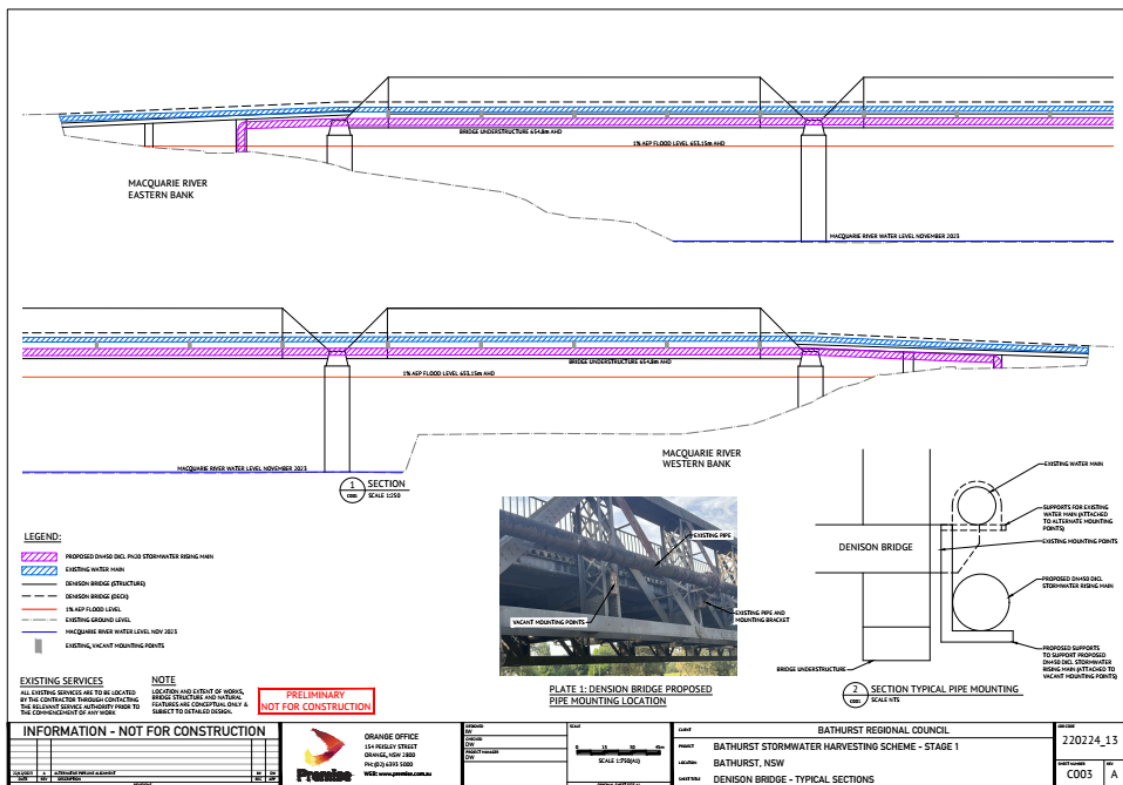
Drawing C003, Bathurst Stormwater Harvesting Scheme – Stage 1, Denison Bridge – Typical Sections. Source: Premise.
